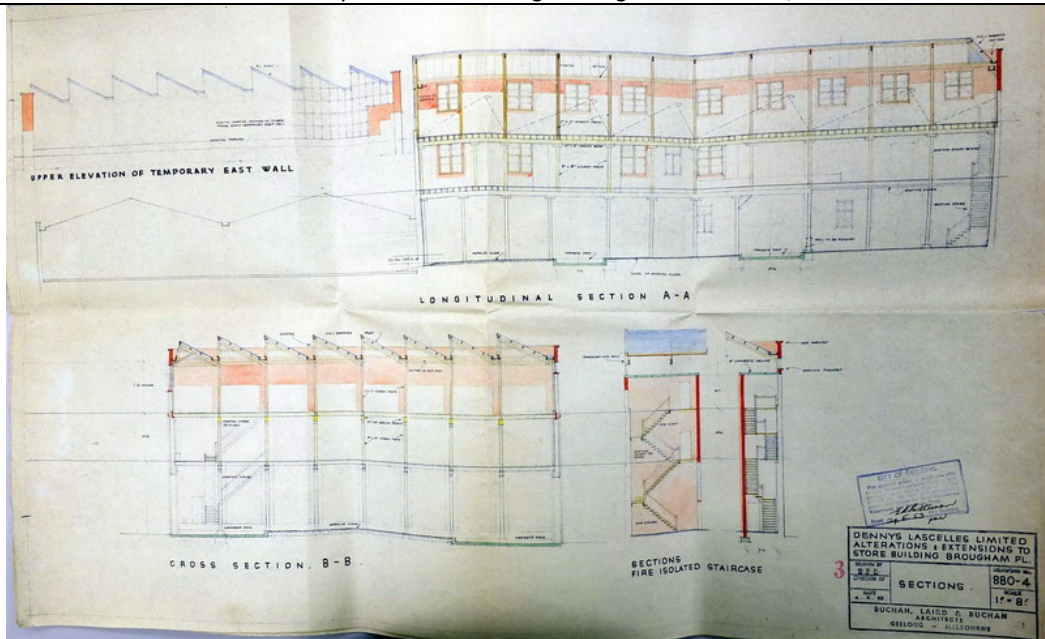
Buchan Laird & Buchan, Section drawings, proposed additions to Dennys Lascelles Ltd, 4 May 1953. Source: City of Greater Geelong Building Permit file 6828/53
